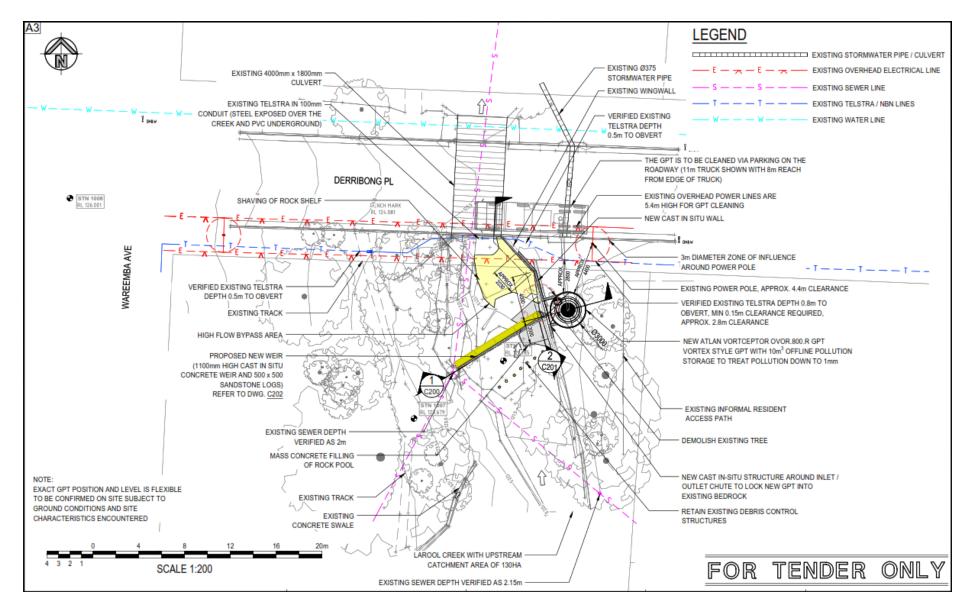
General arrangement of site elements (Optimal Stormwater 2024)
